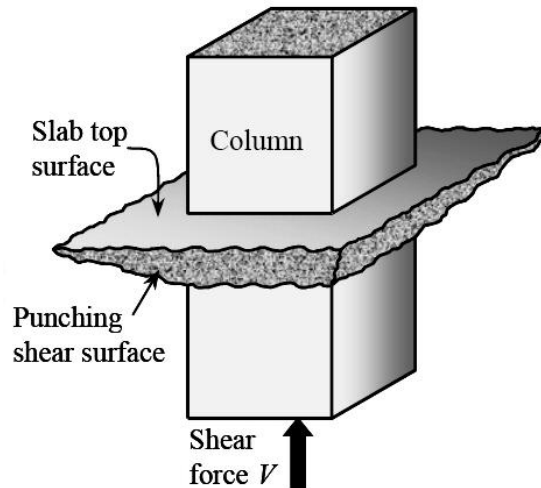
Punching shear failure of a slab-column connection (Stein 2006)
